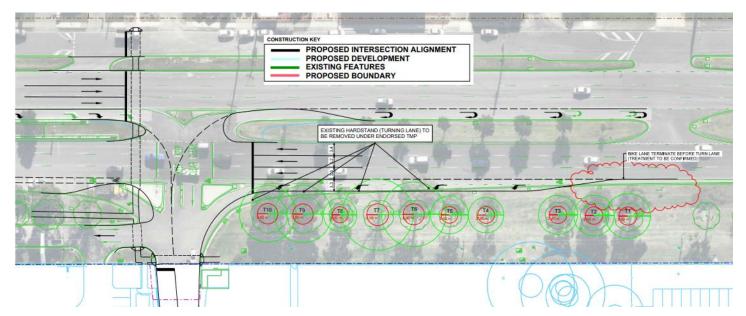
Concept design for intersection, showing on-road bicycle lane relocated and proposed left-turn lane located further north of street trees
